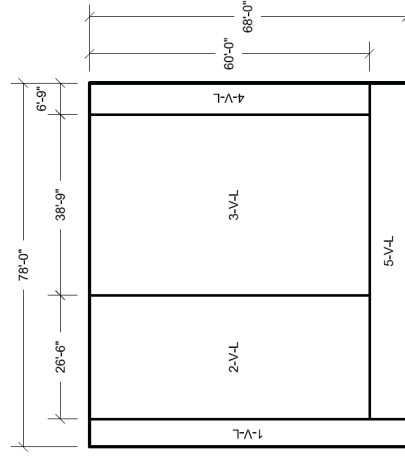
H.67: PUMP HOUSE EAST WALL LOOKING WEST
